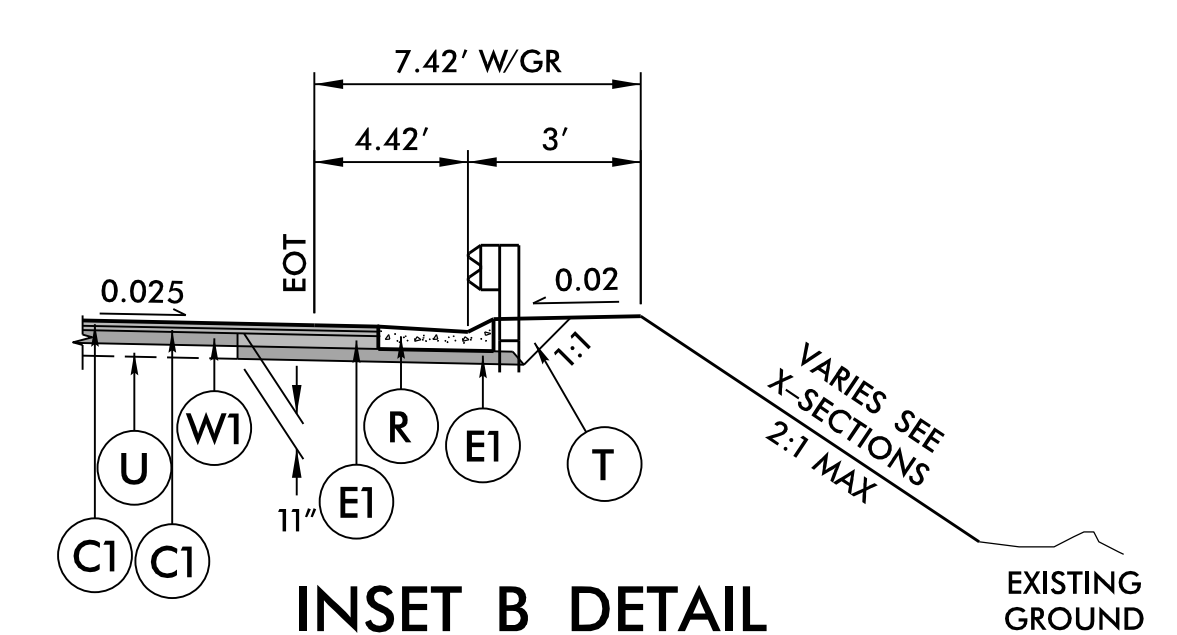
DETAIL SHOWING GUARDRAIL PLACEMENT
